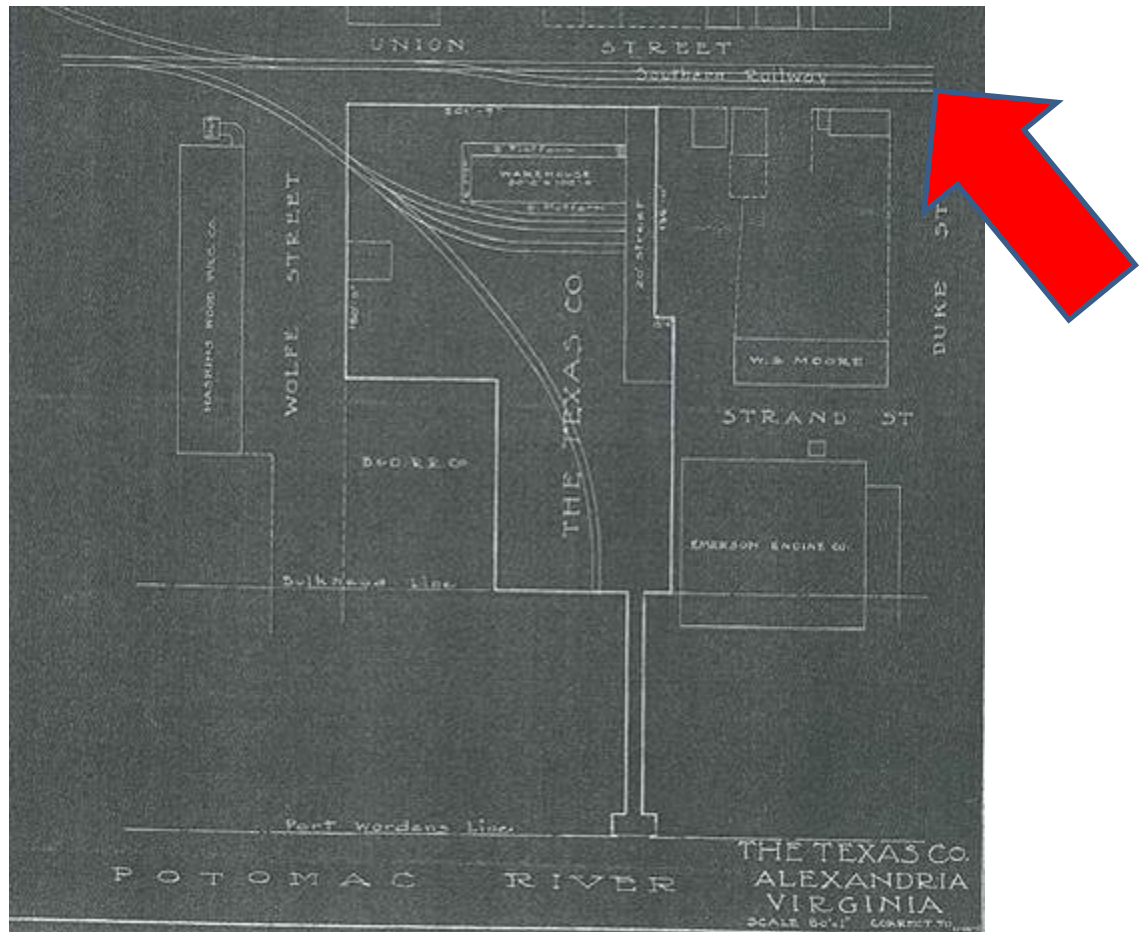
1912 Building permit for RTS showing location of pair of railroad tracks on Union Street. Source: Alexandria Special Collections
